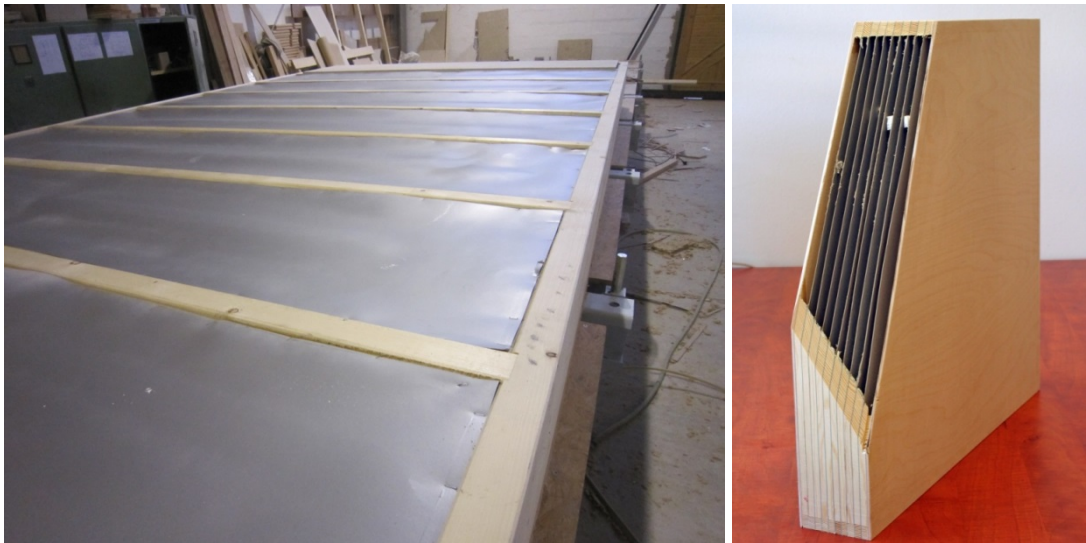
The Mirrorpanel wall system a) full panel surface, b) panel cross section
